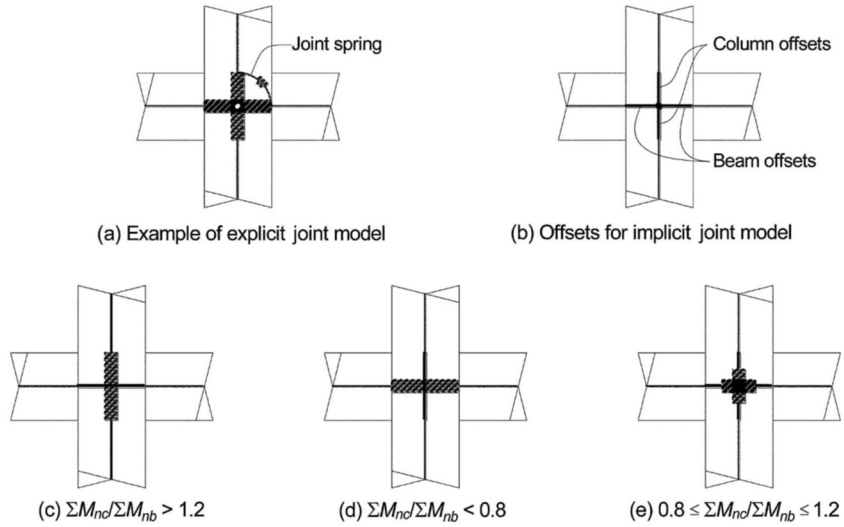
Beam-column joint modeling. Hatched portion indicates rigid element.
